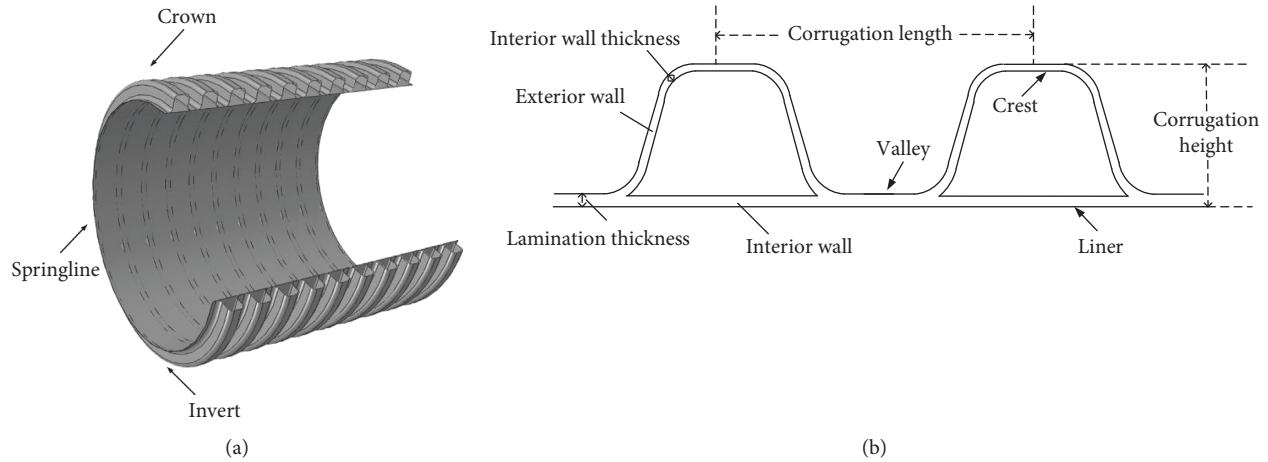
Profile of pipes: (a) section through pipes; (b) cross section of pipe walls.
